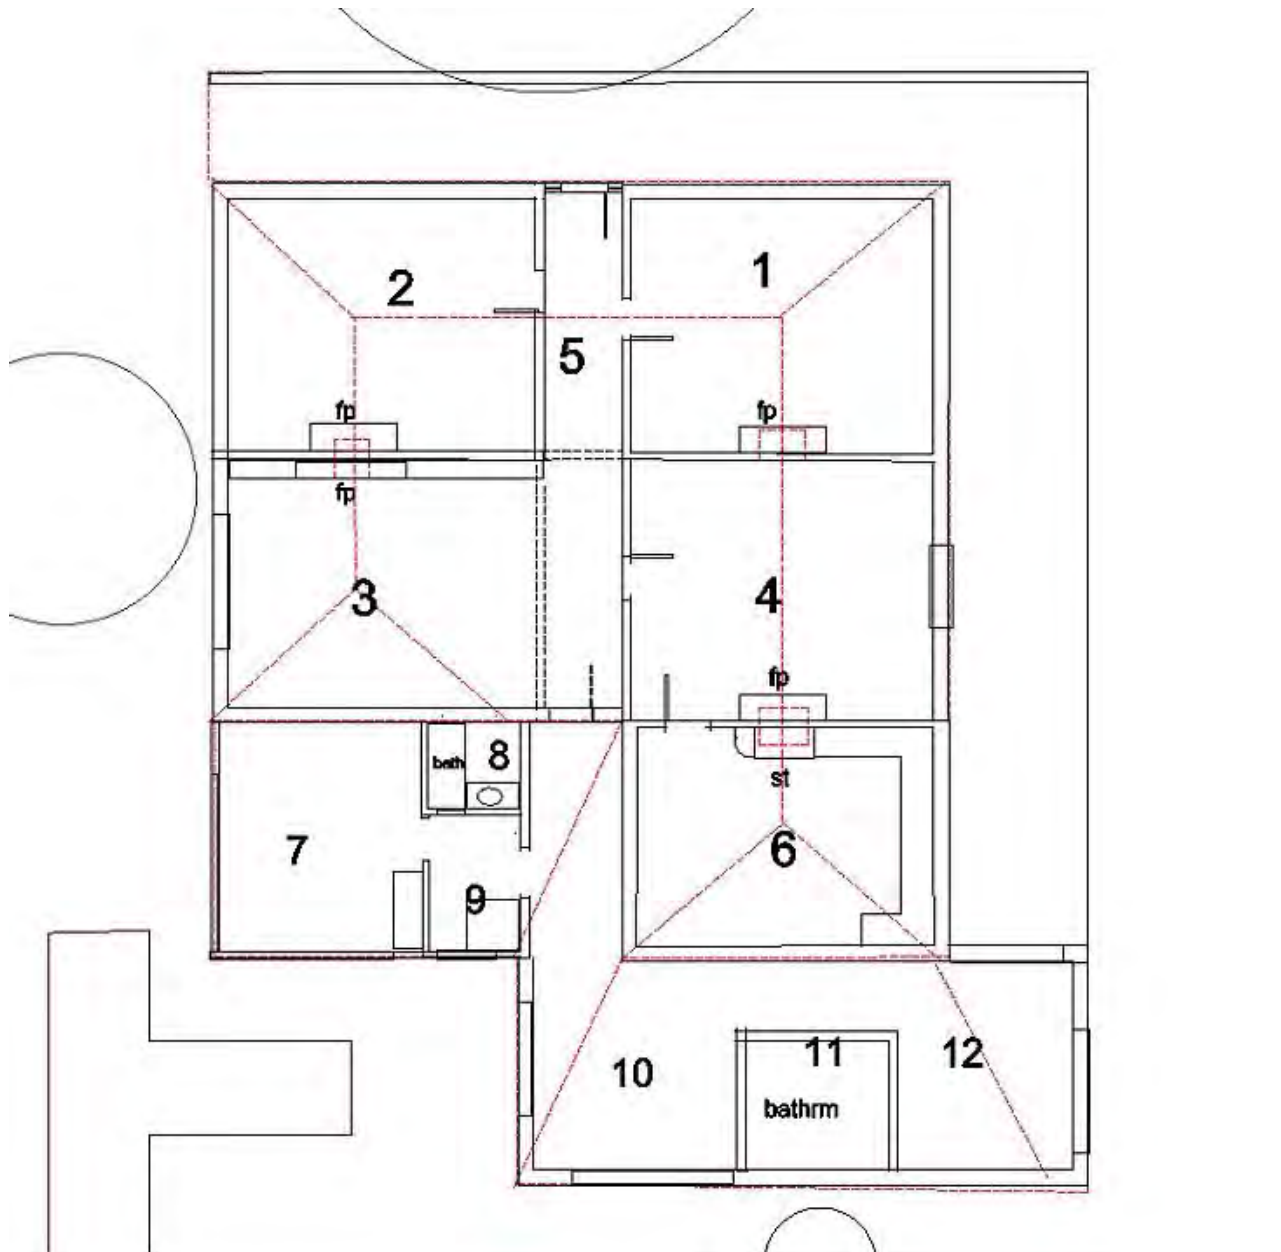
Kerr Farmhouse Plan (Butler 2020)
